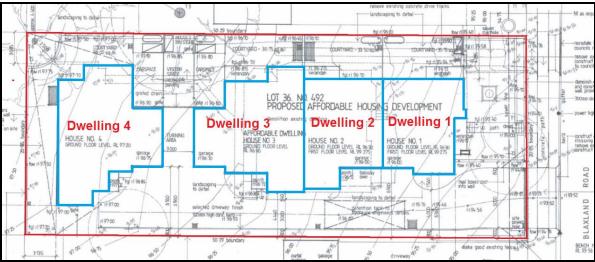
Site Plan extract of the proposed development with each of the four (4) dwellings proposed highlighted in blue and labelled in red. The thin red perimeter highlight represents the boundary of the subject site at 492 Blaxland Road, Denistone.
